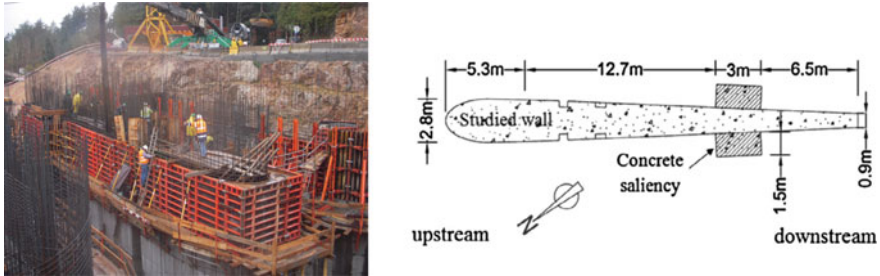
Wall of entrance of Paradela's dam spillway: construction phase studied (Photograph M. Azenha; Drawing Azenha et al. 2014)
